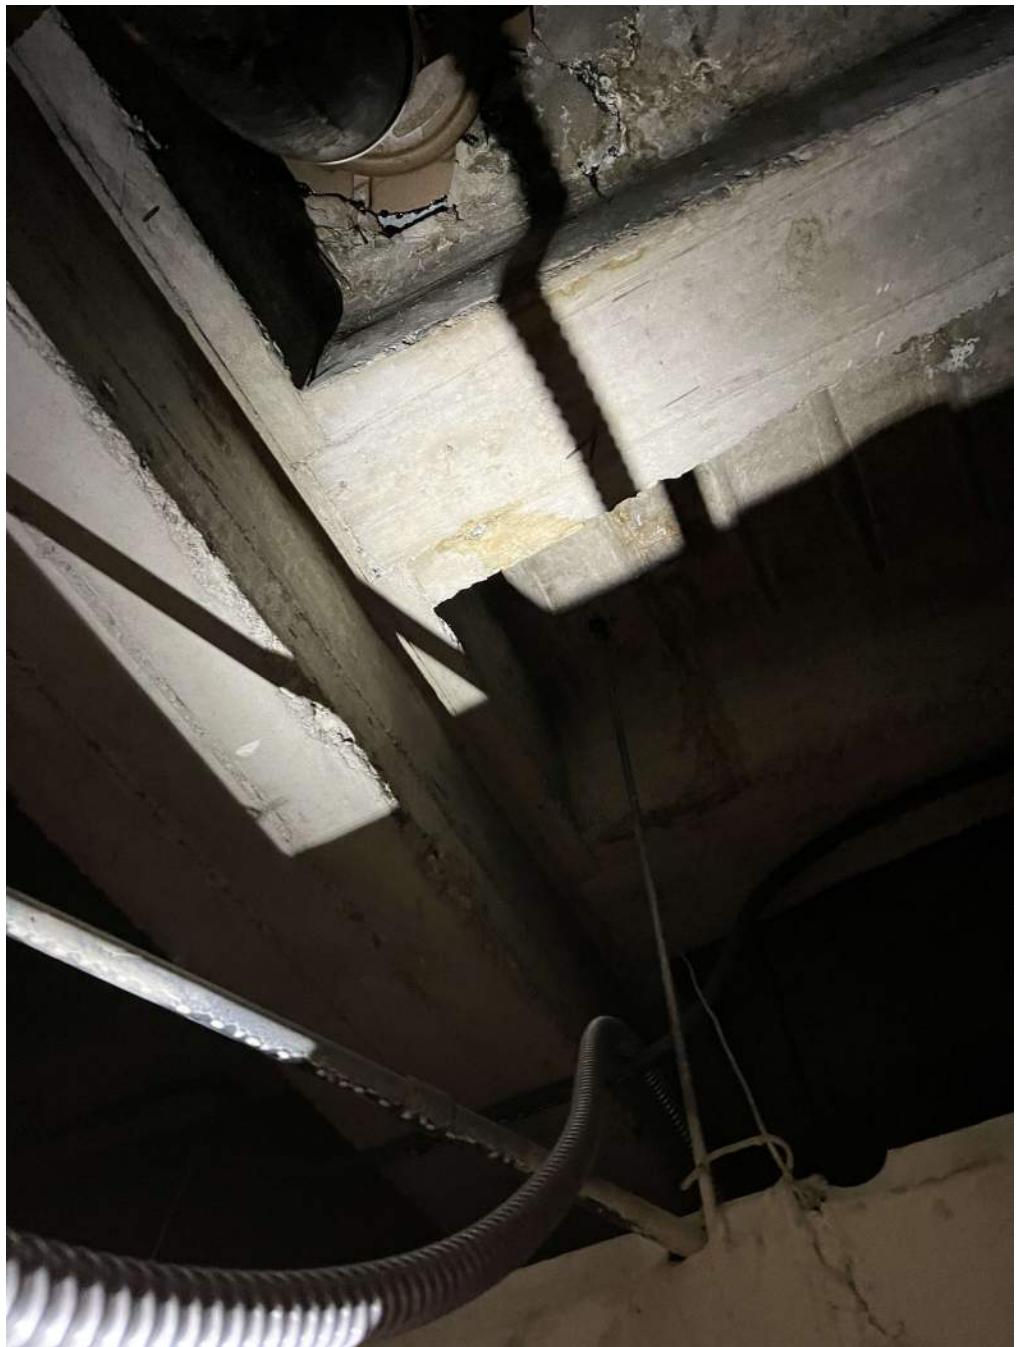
View of typical pan-joist at Levels 2, 3, 4, and Main Roof/Penthouse.
